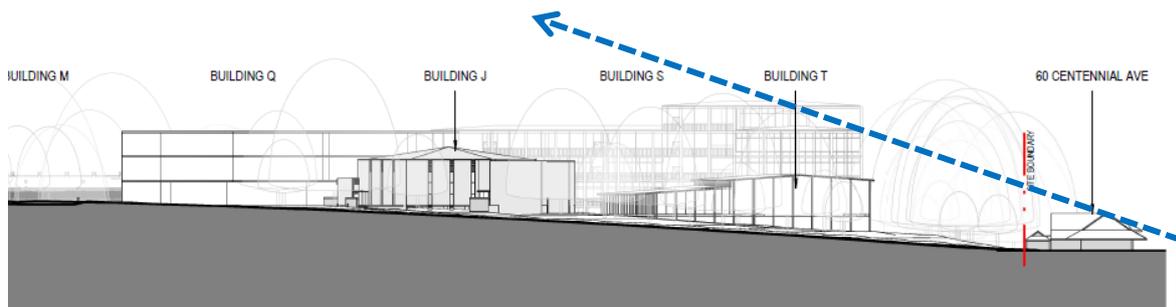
Centennial Avenue Campus – Proposed Street Elevation from Centennial Avenue, looking north to south. Note the visibility of heritage building, Item Number I67 (on the right-hand side of the elevation). The blue arrow indicates the view line from the corner of Centennial Avenue and Dardanelles Road towards proposed new Building T. Source Architectus. Overlay by the author. December 2019.
